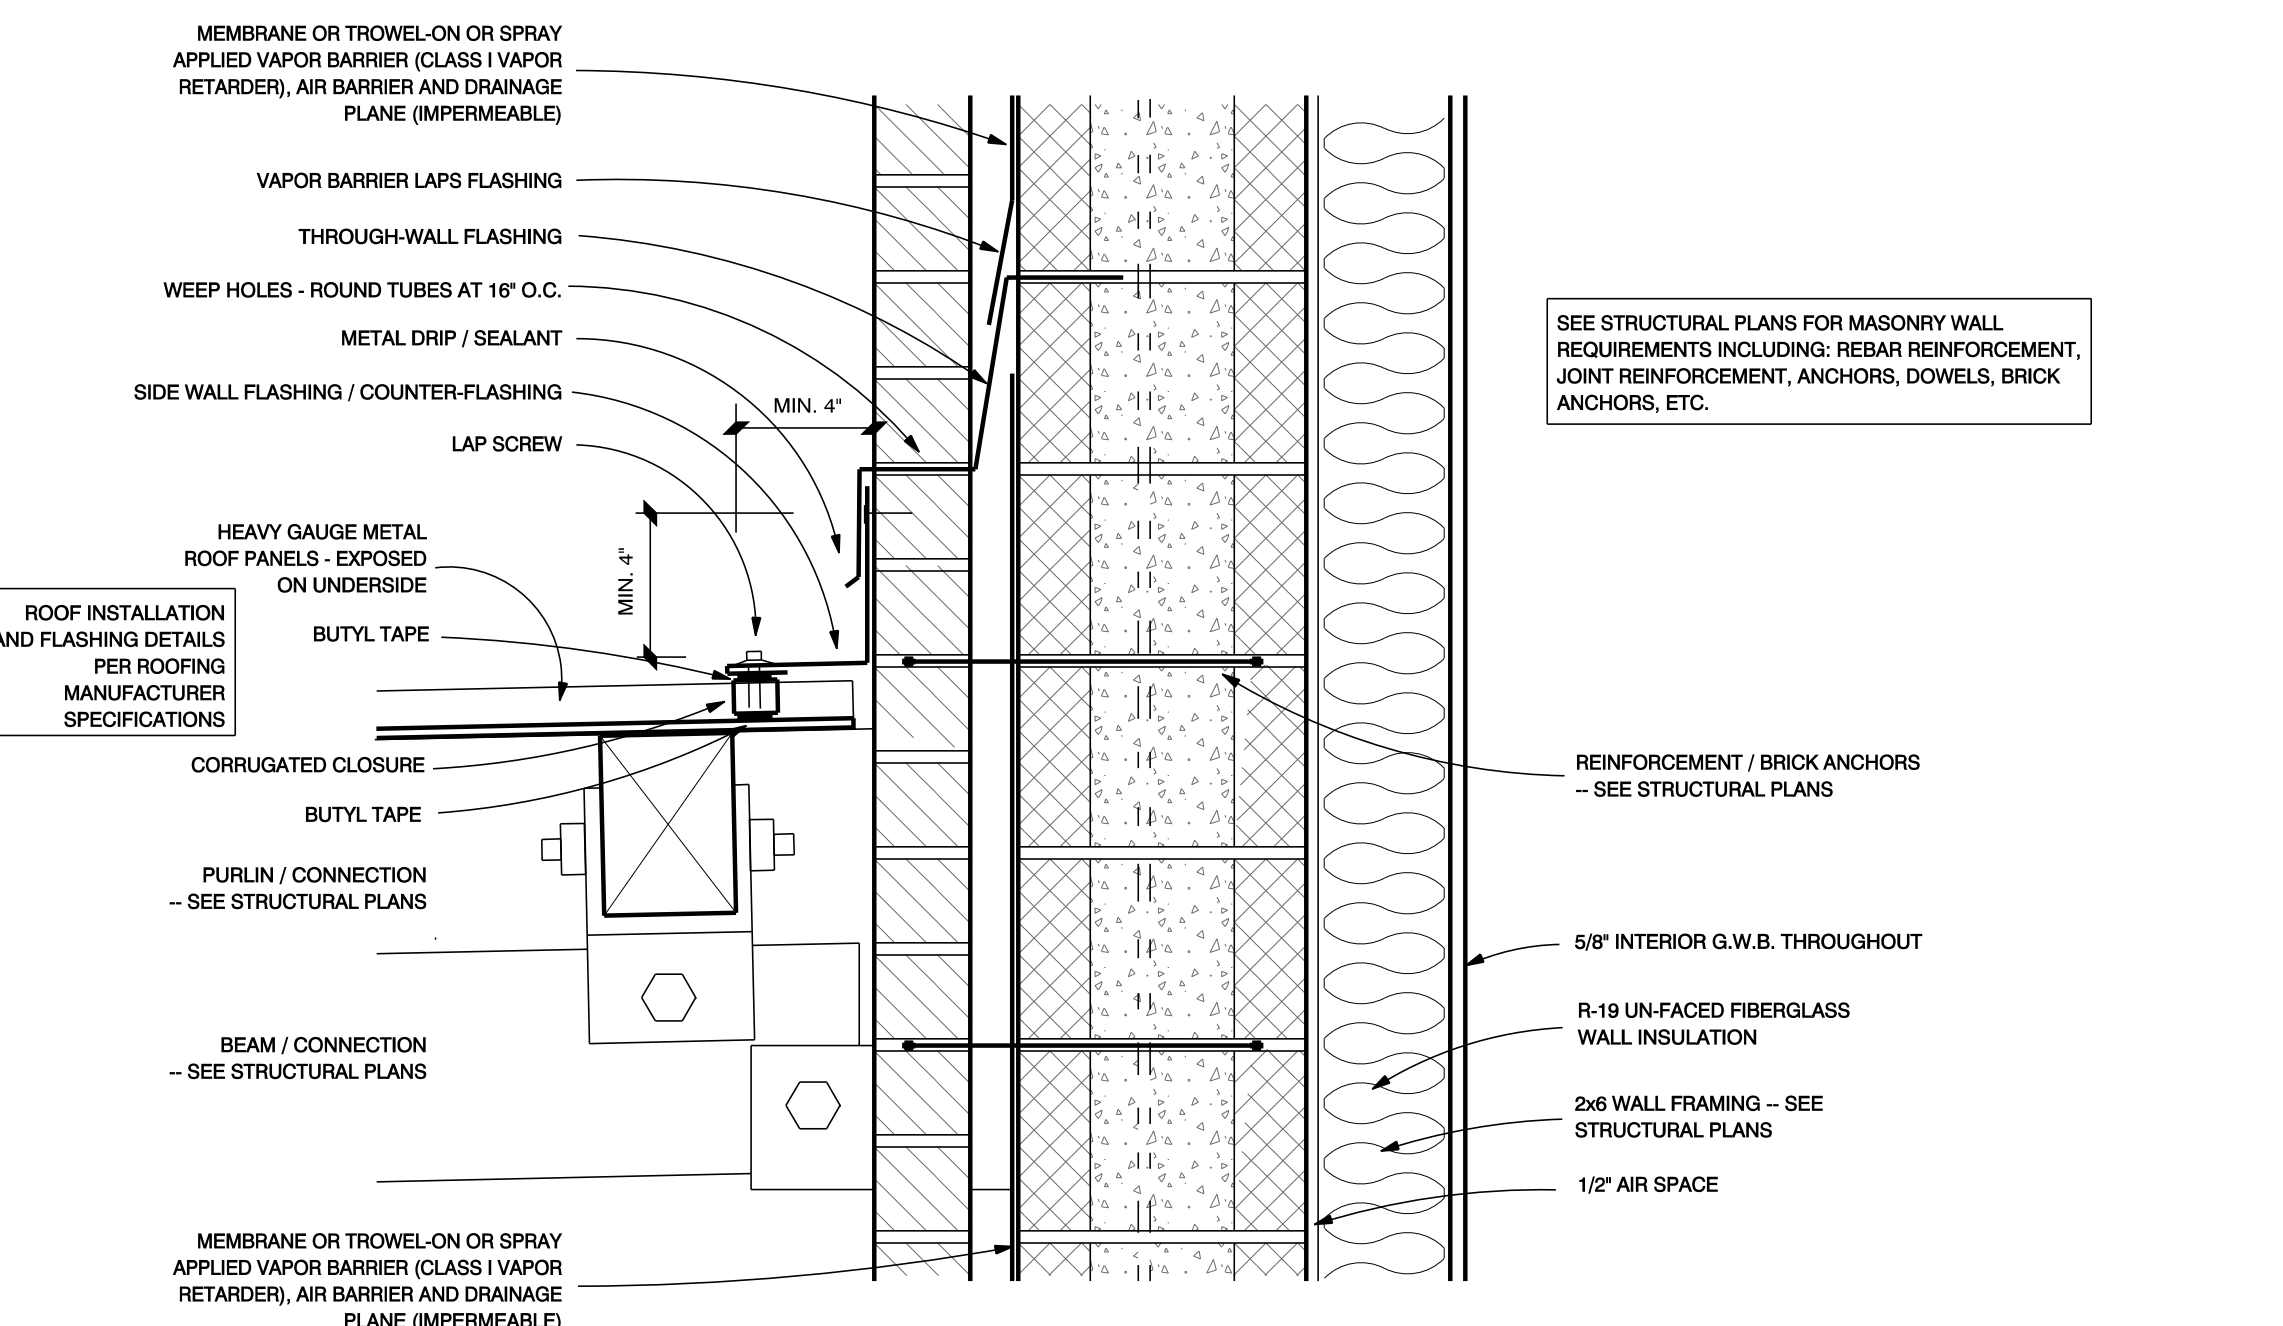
DETAILS AND NOTES AS PER BRICK INDUSTRY ASSOCIATION TECHNICAL NOTES ON BRICK CONSTRUCTION DOCUMENT 21-B
